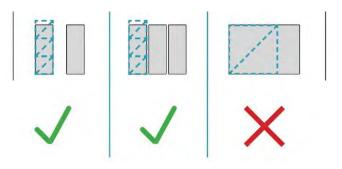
G.1: Vertical Window Proportion. Left, vertical window opening (permitted); center, grouping of vertically proportioned windows to fill a horizontal opening (permitted); right, horizontally proportioned window (not permitted)
